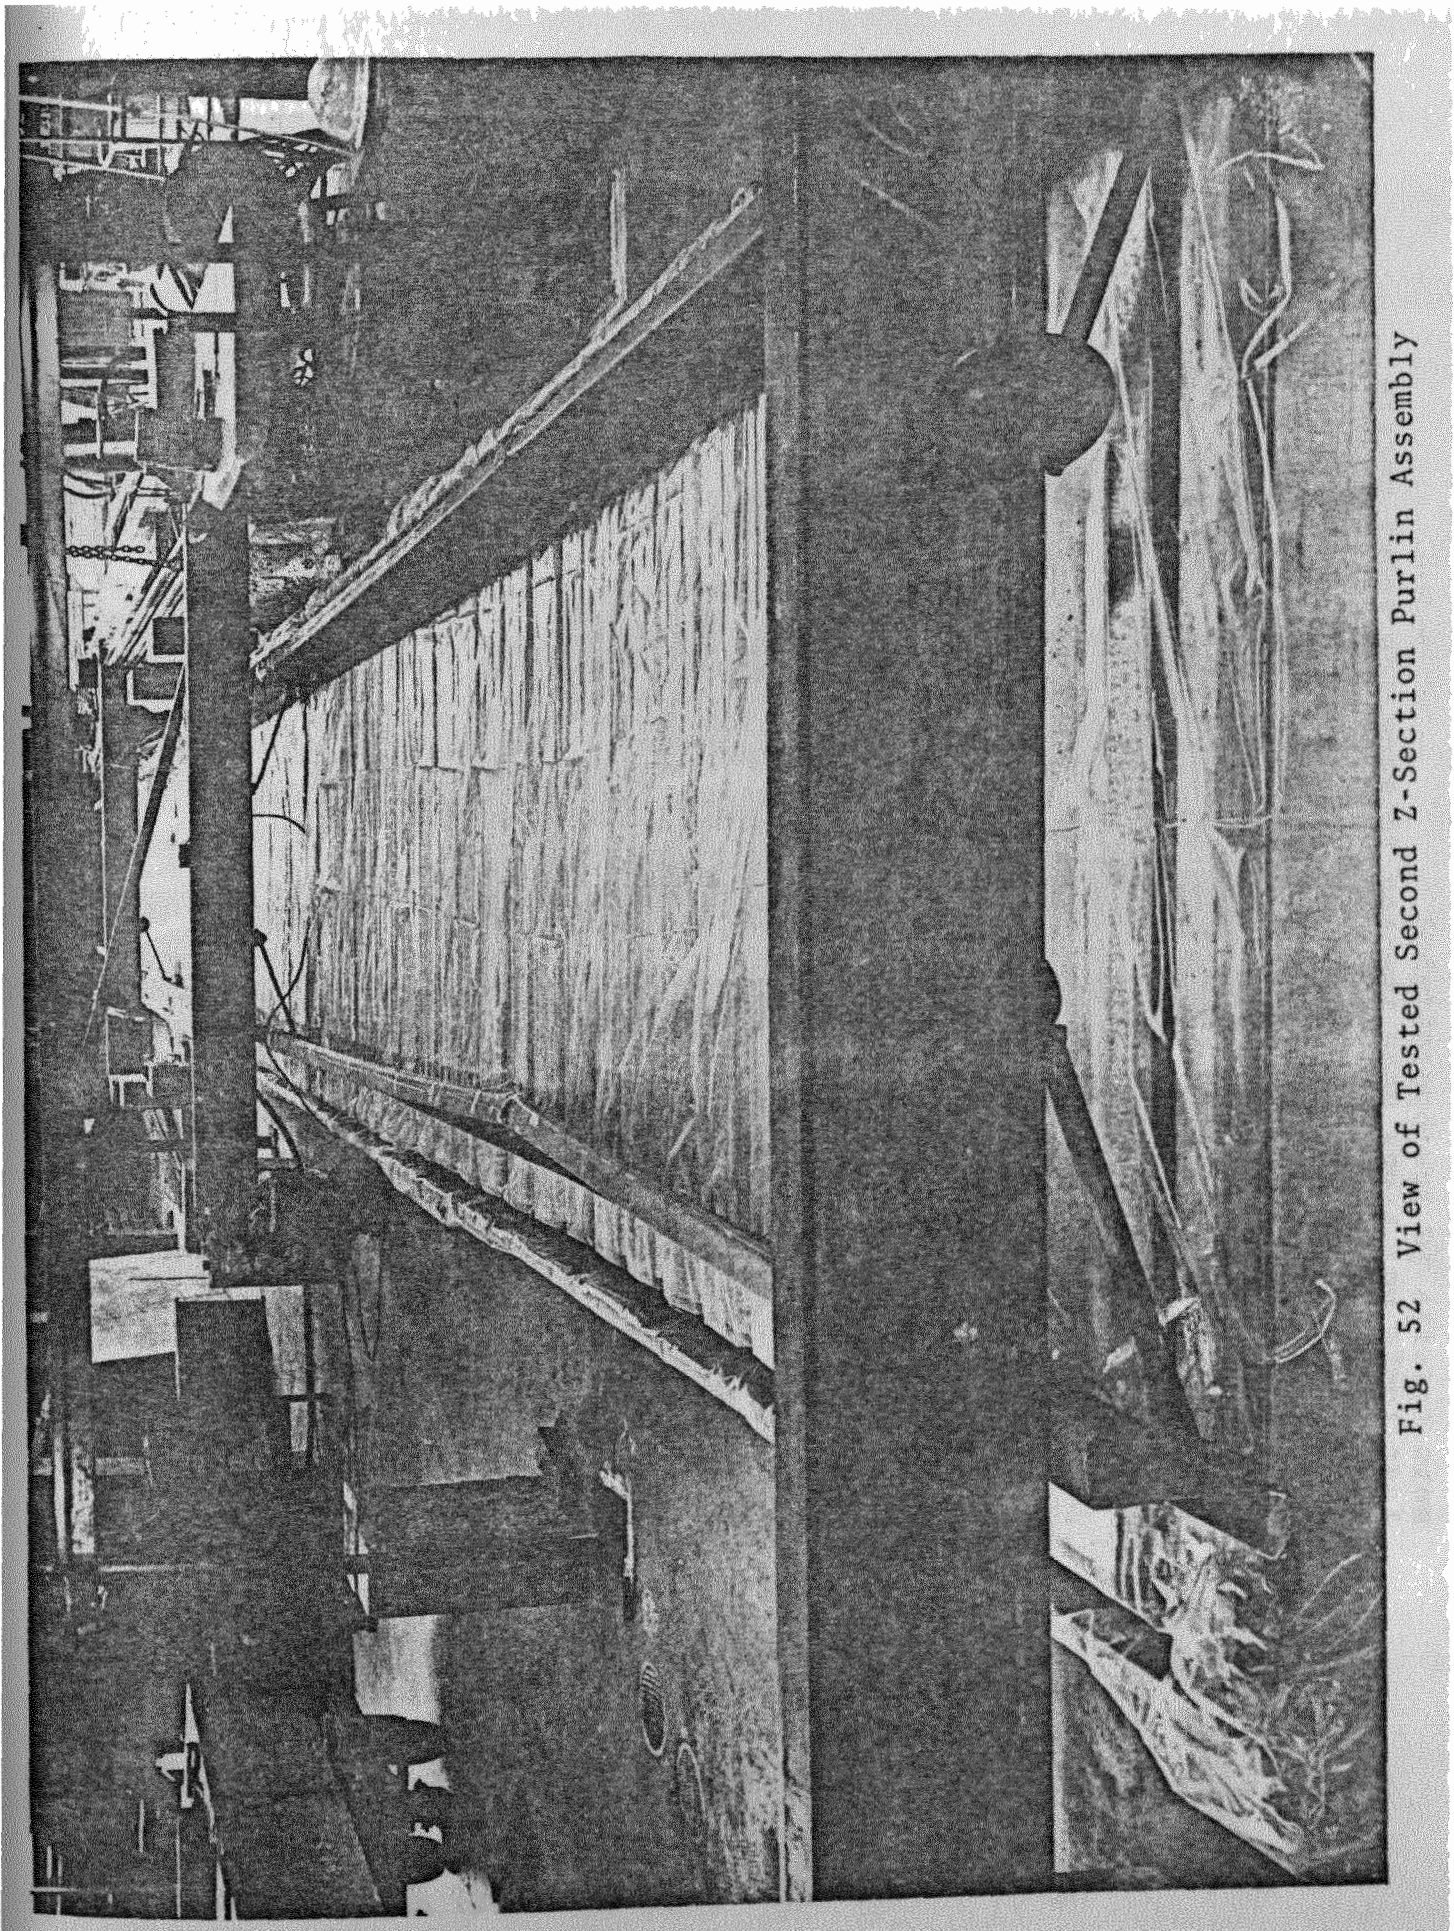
View of Tested Second Z-Section Purlin Assembly
